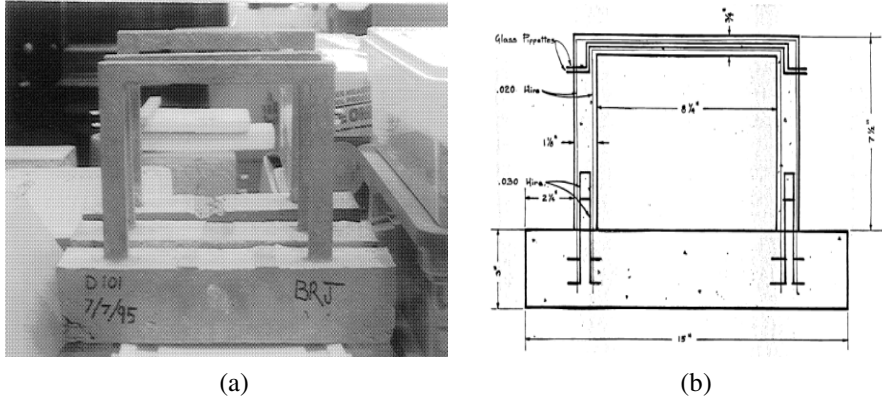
(a) Photo of test frame, glass pipettes can be seen extending to the exterior for filling with adhesive; (b) Drawing of a concrete test frame [4.48].
